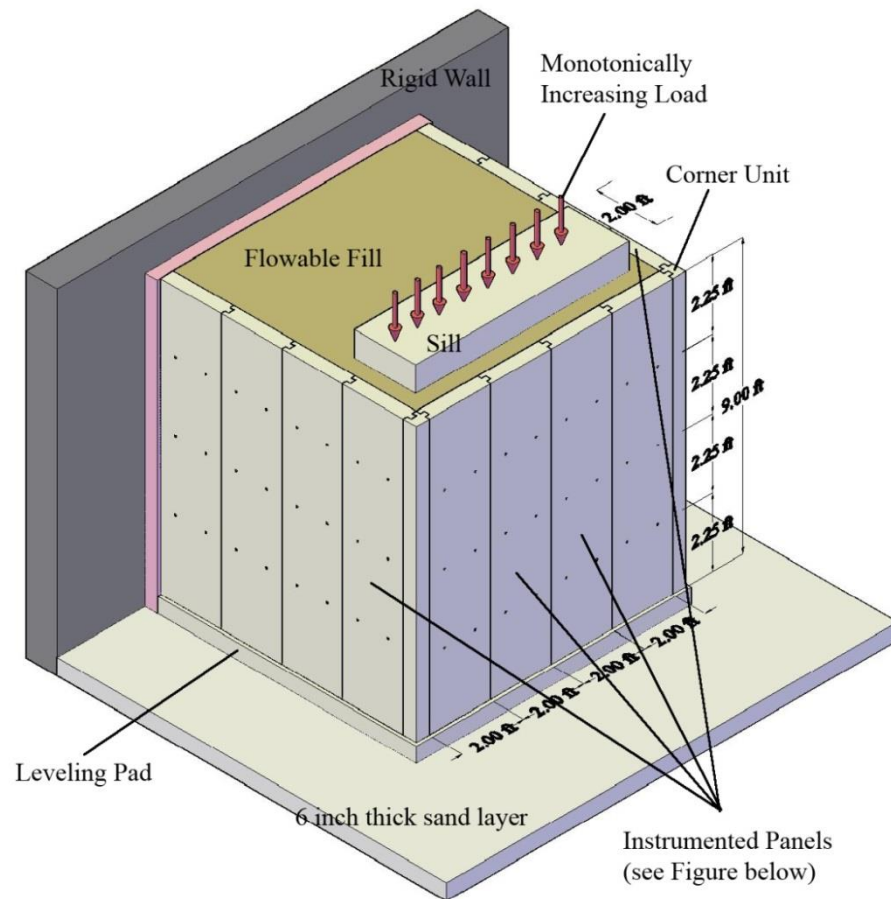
Large scale laboratory test of CLSM bridge abutment.
